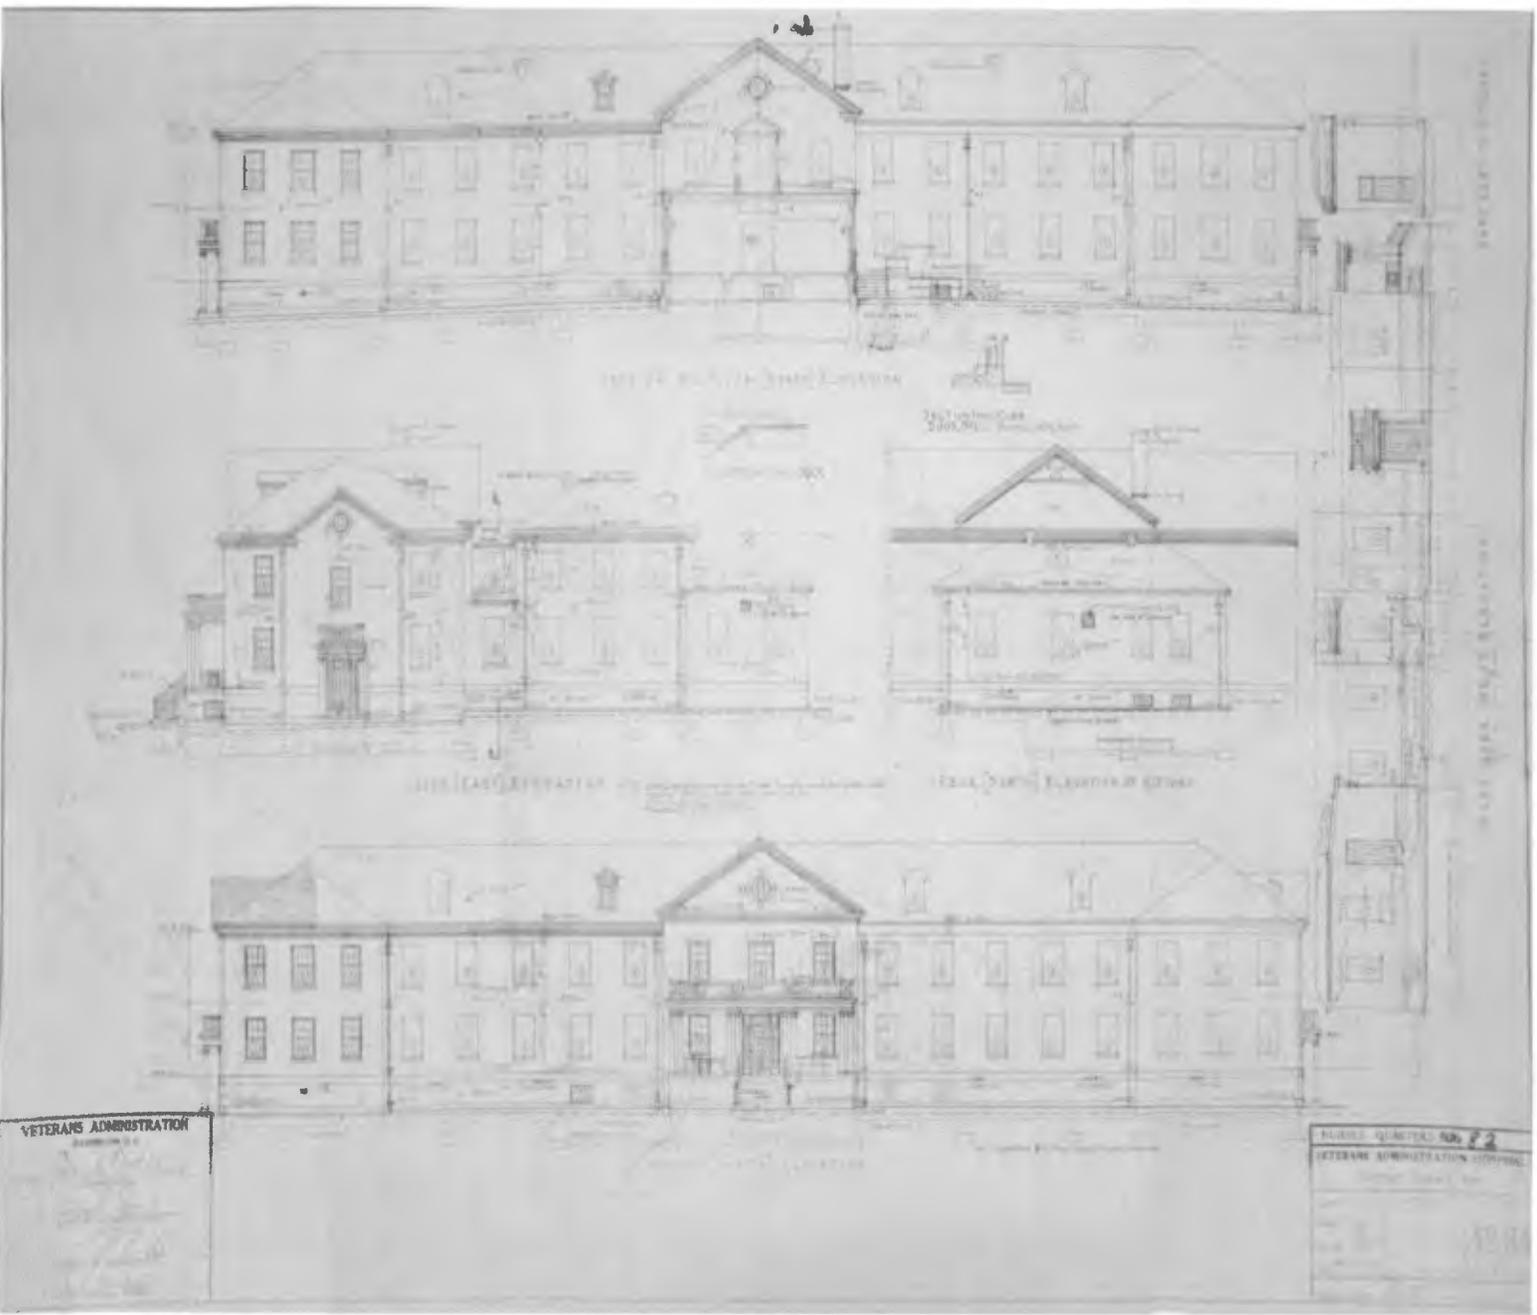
Building 82, Elevations and Details, dated 1932 (Perry Point Engineer Records)
